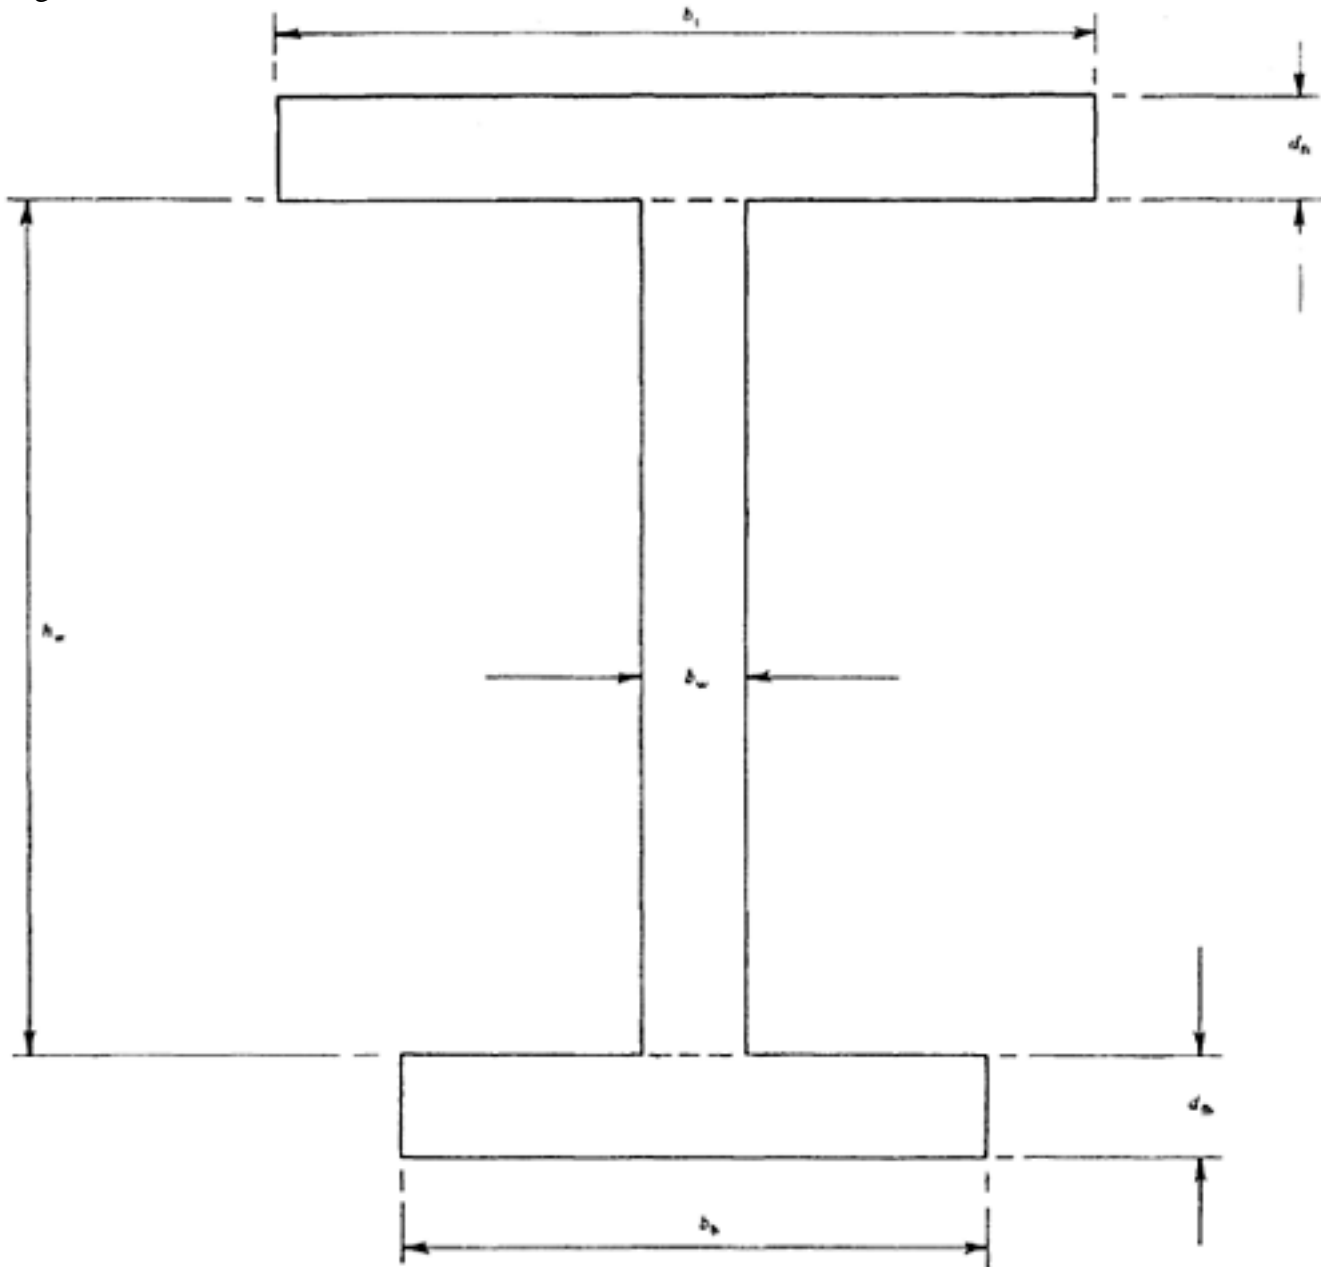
I-beams divided into rectangles to obtain torsional shear stress determined on the basis of plastic analysis of the space truss model in which reinforcements take the tension.
